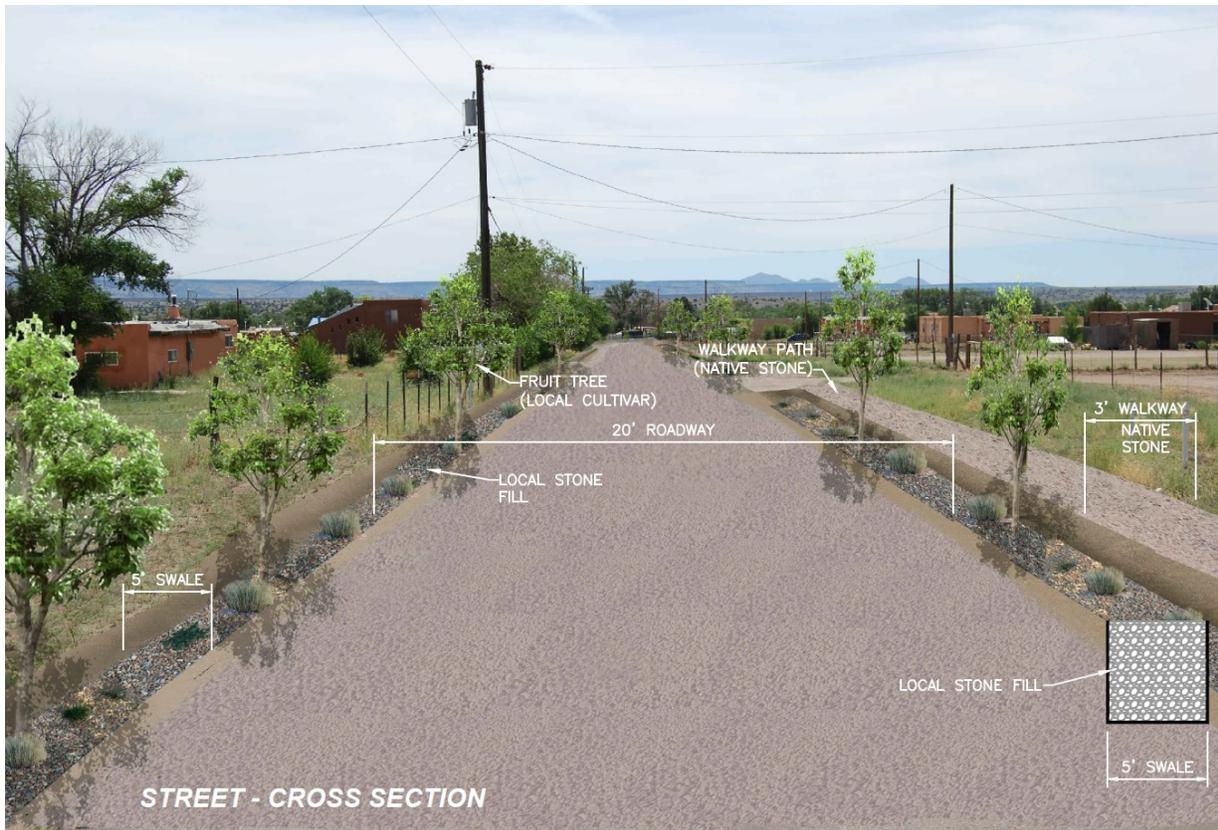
Proposed green street concept design cross section for Turquoise Street.
